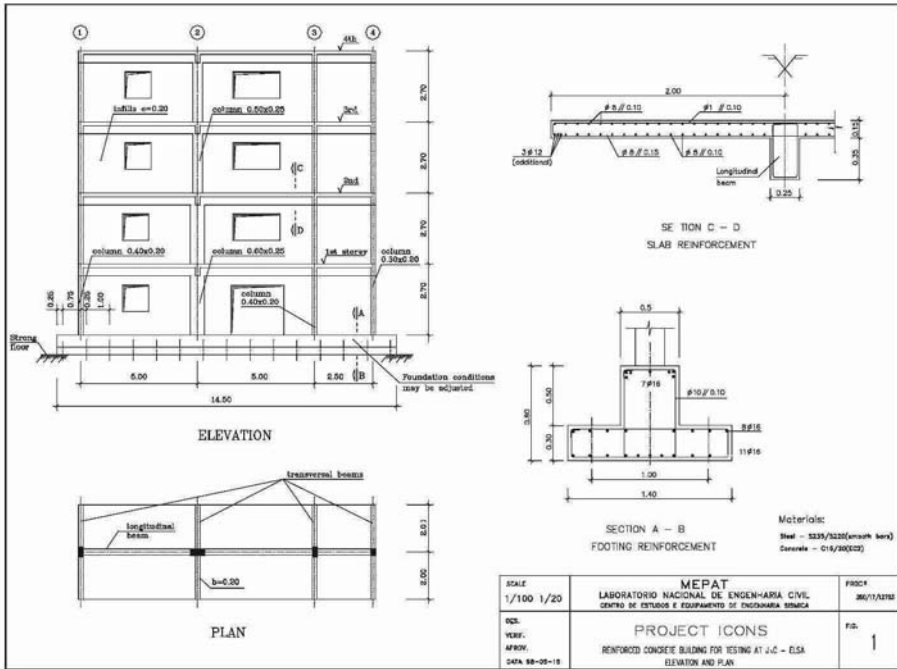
Plan and elevation views of the concrete frame and the masonry infilled building
